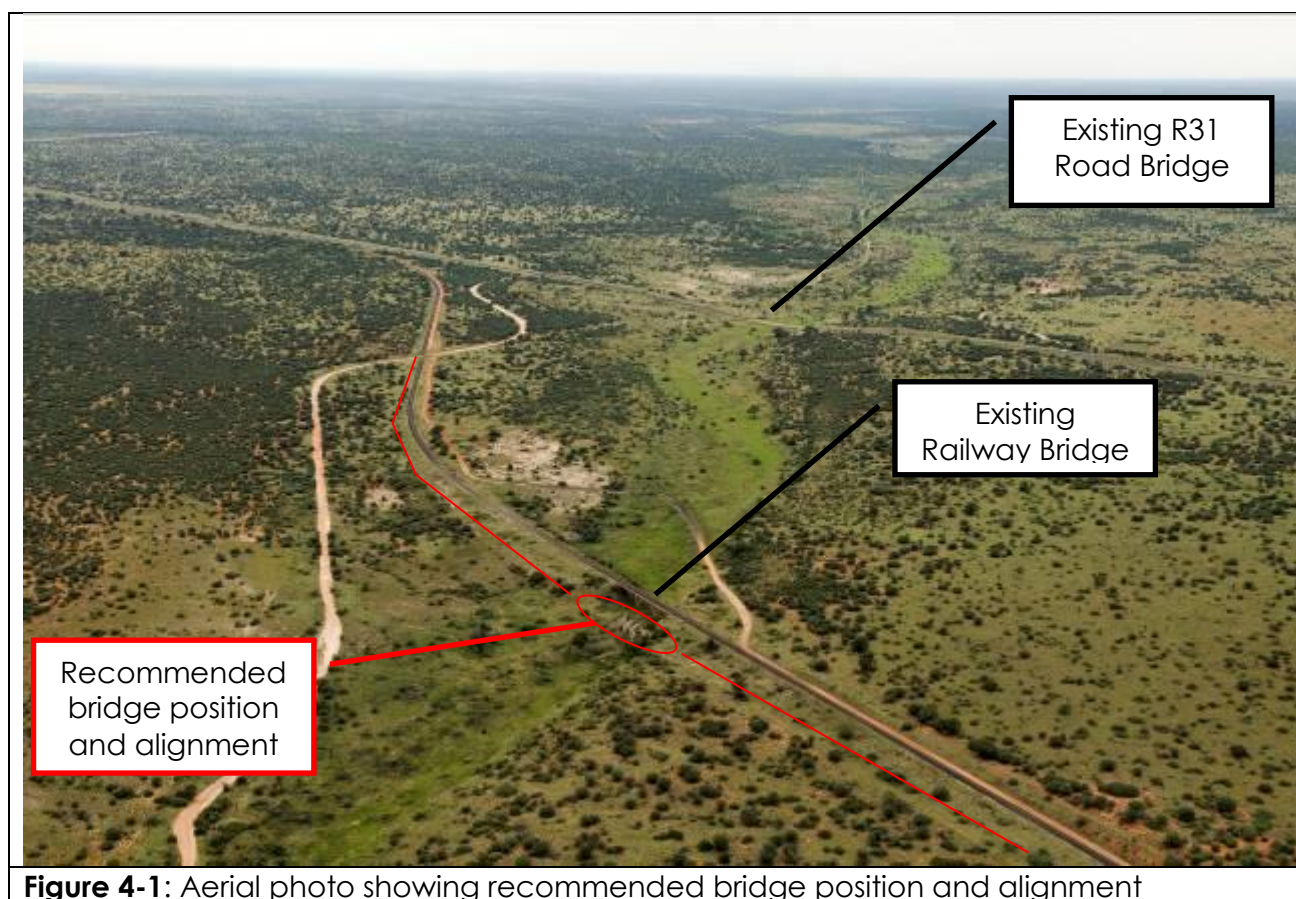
Aerial photo showing recommended bridge position and alignment
